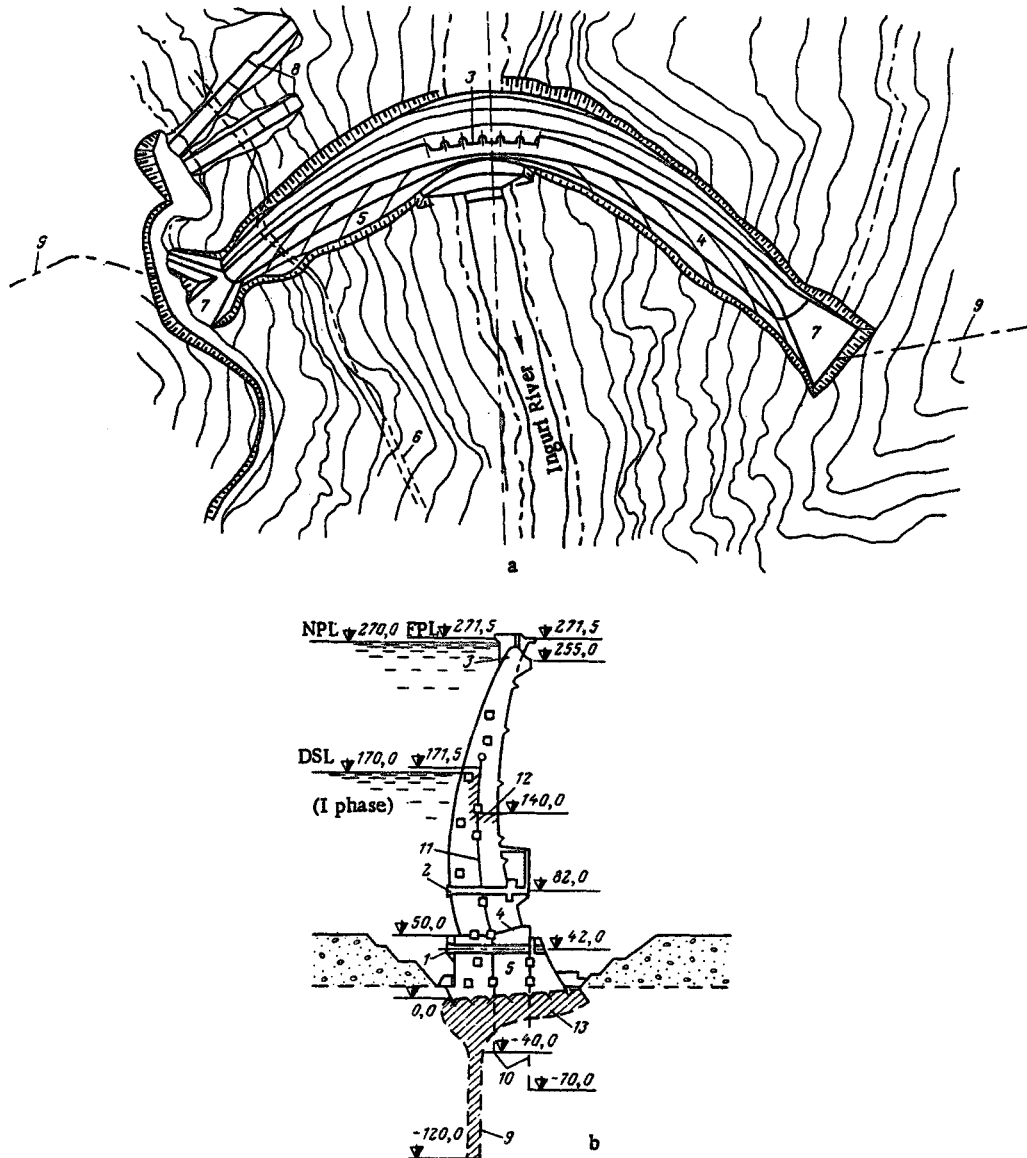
Arch dam of the Inguri hydrostation. a) Plan; b) section through central cantilever. 1) Temporary outlets; 2) dewatering outlet; 3) surface spillway; 4) perimetric joint; 5) seat; 6) right-bank fault; 7) gravity abutments; 8) water intake; 9) grout curtain; 10) drainage curtains; 11) longitudinal joint; 12) boundary of first phase of dam; 13) grouting.
